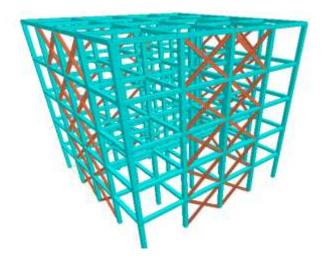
DIAGONAL BRACING FOR MODEL "B"
